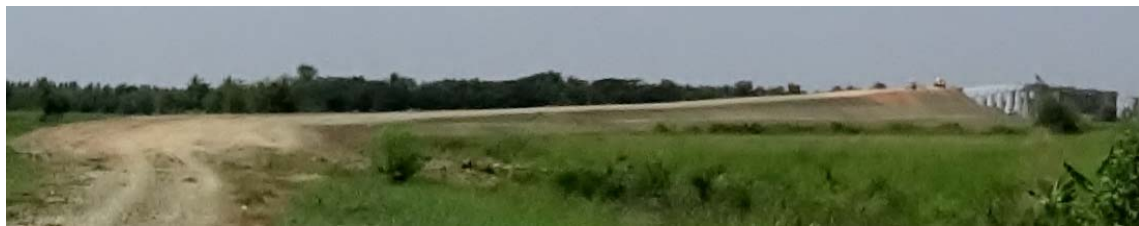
Side View of the Slope Embankment: (as of May 2015 on completion of embankment)
